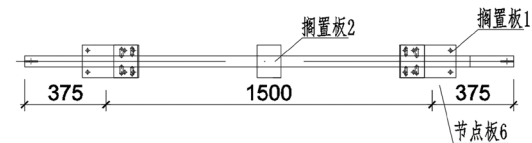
Long transom in a floor plan drawing (unit: mm)
